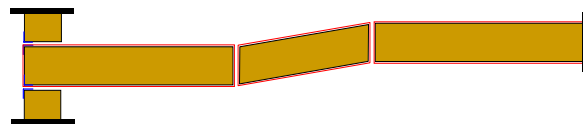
Plan arrangement of a tie realised with CAM, which follows the irregularity of the wall.
